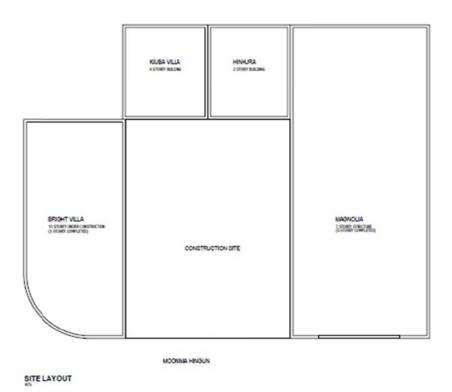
SITE LAYOUT OF INSPECTION LOCATIONS
